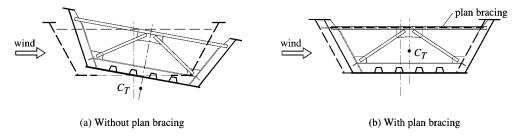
Influence of the upper plan bracing on the position of the shear centre  $C_T$  and the deformation of an open section.
